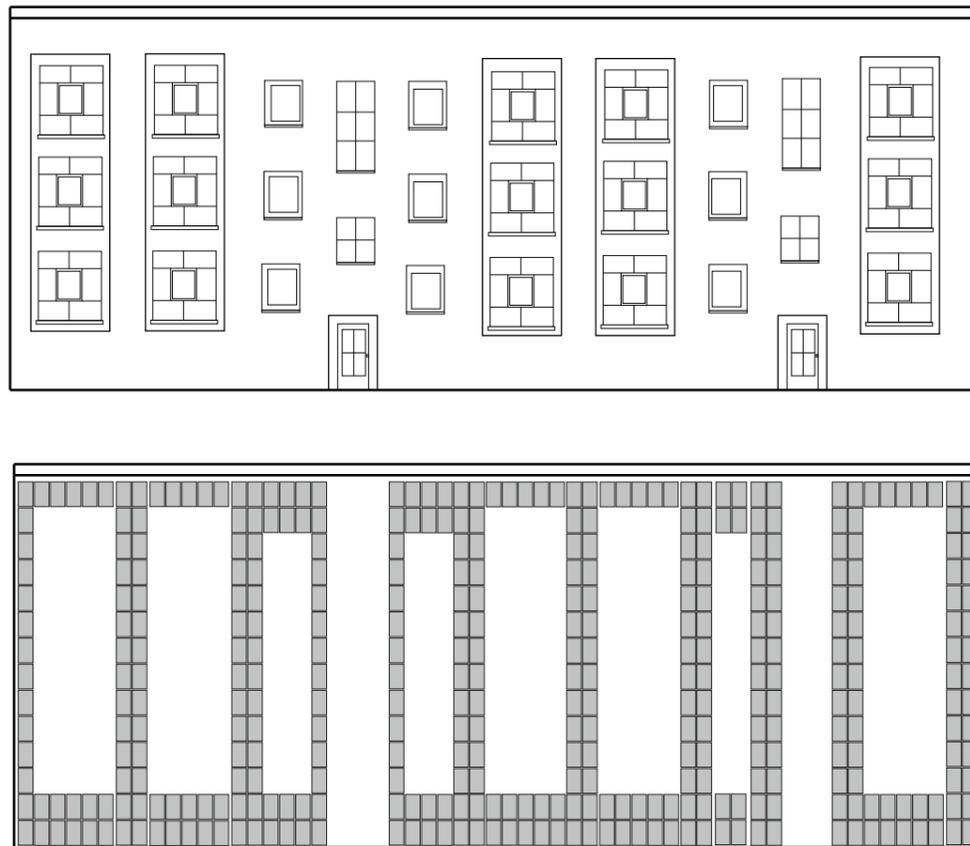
Facade paneling on architectural typology in LCZ 5
